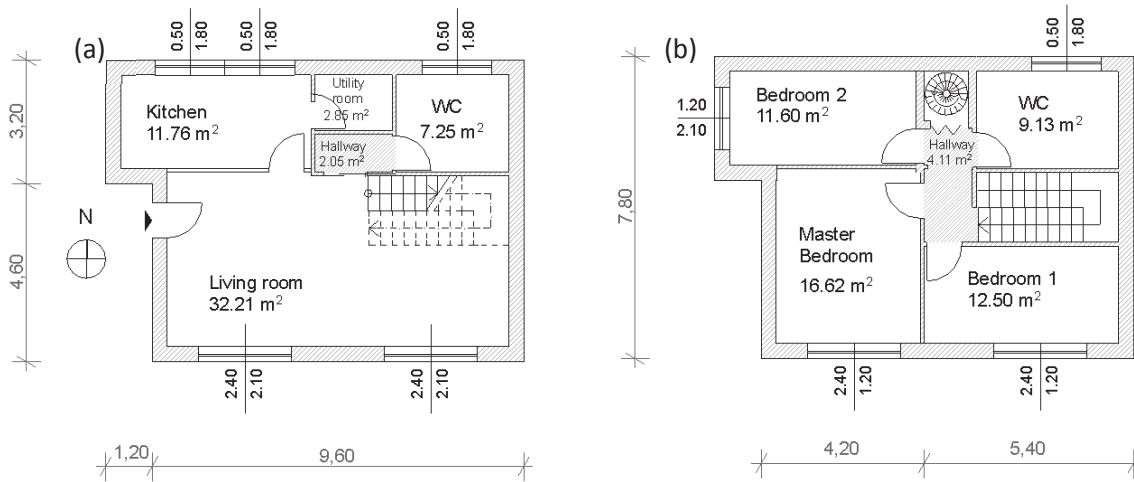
Detached house plans: (a) ground floor and (b) first floor
